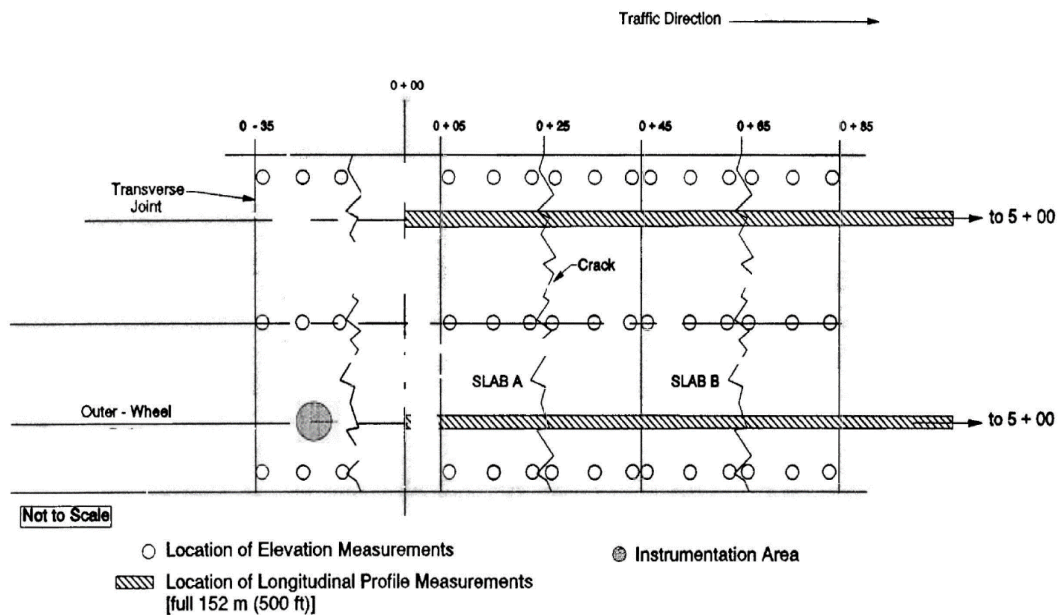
Elevation and Profile Data Collection Plan – JRC Pavements (Rada et al., 1994)
